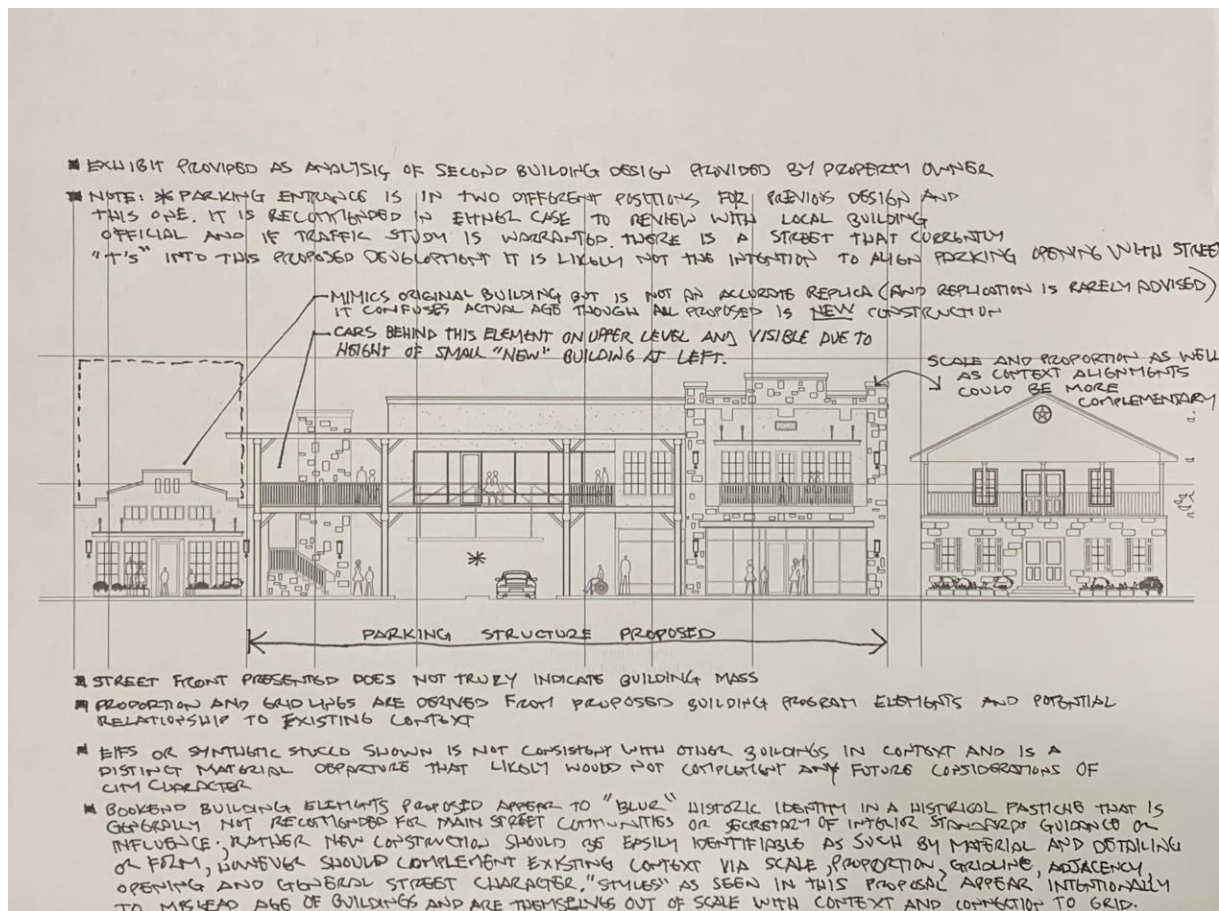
Second Street Elevation Proposed (Refer Notes)
